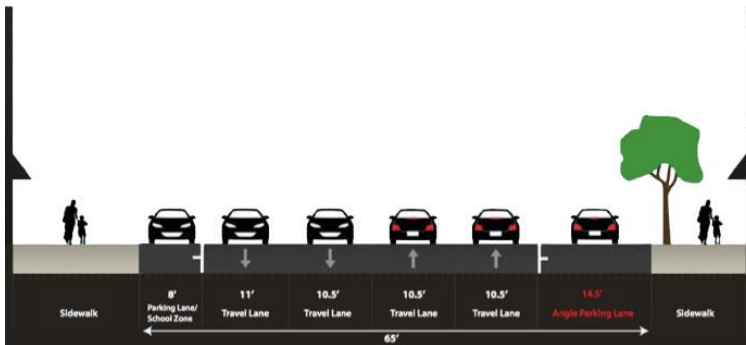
Willow Avenue Cross Section - 11th St to 13th St (source: HobokenNJ, 2014)
